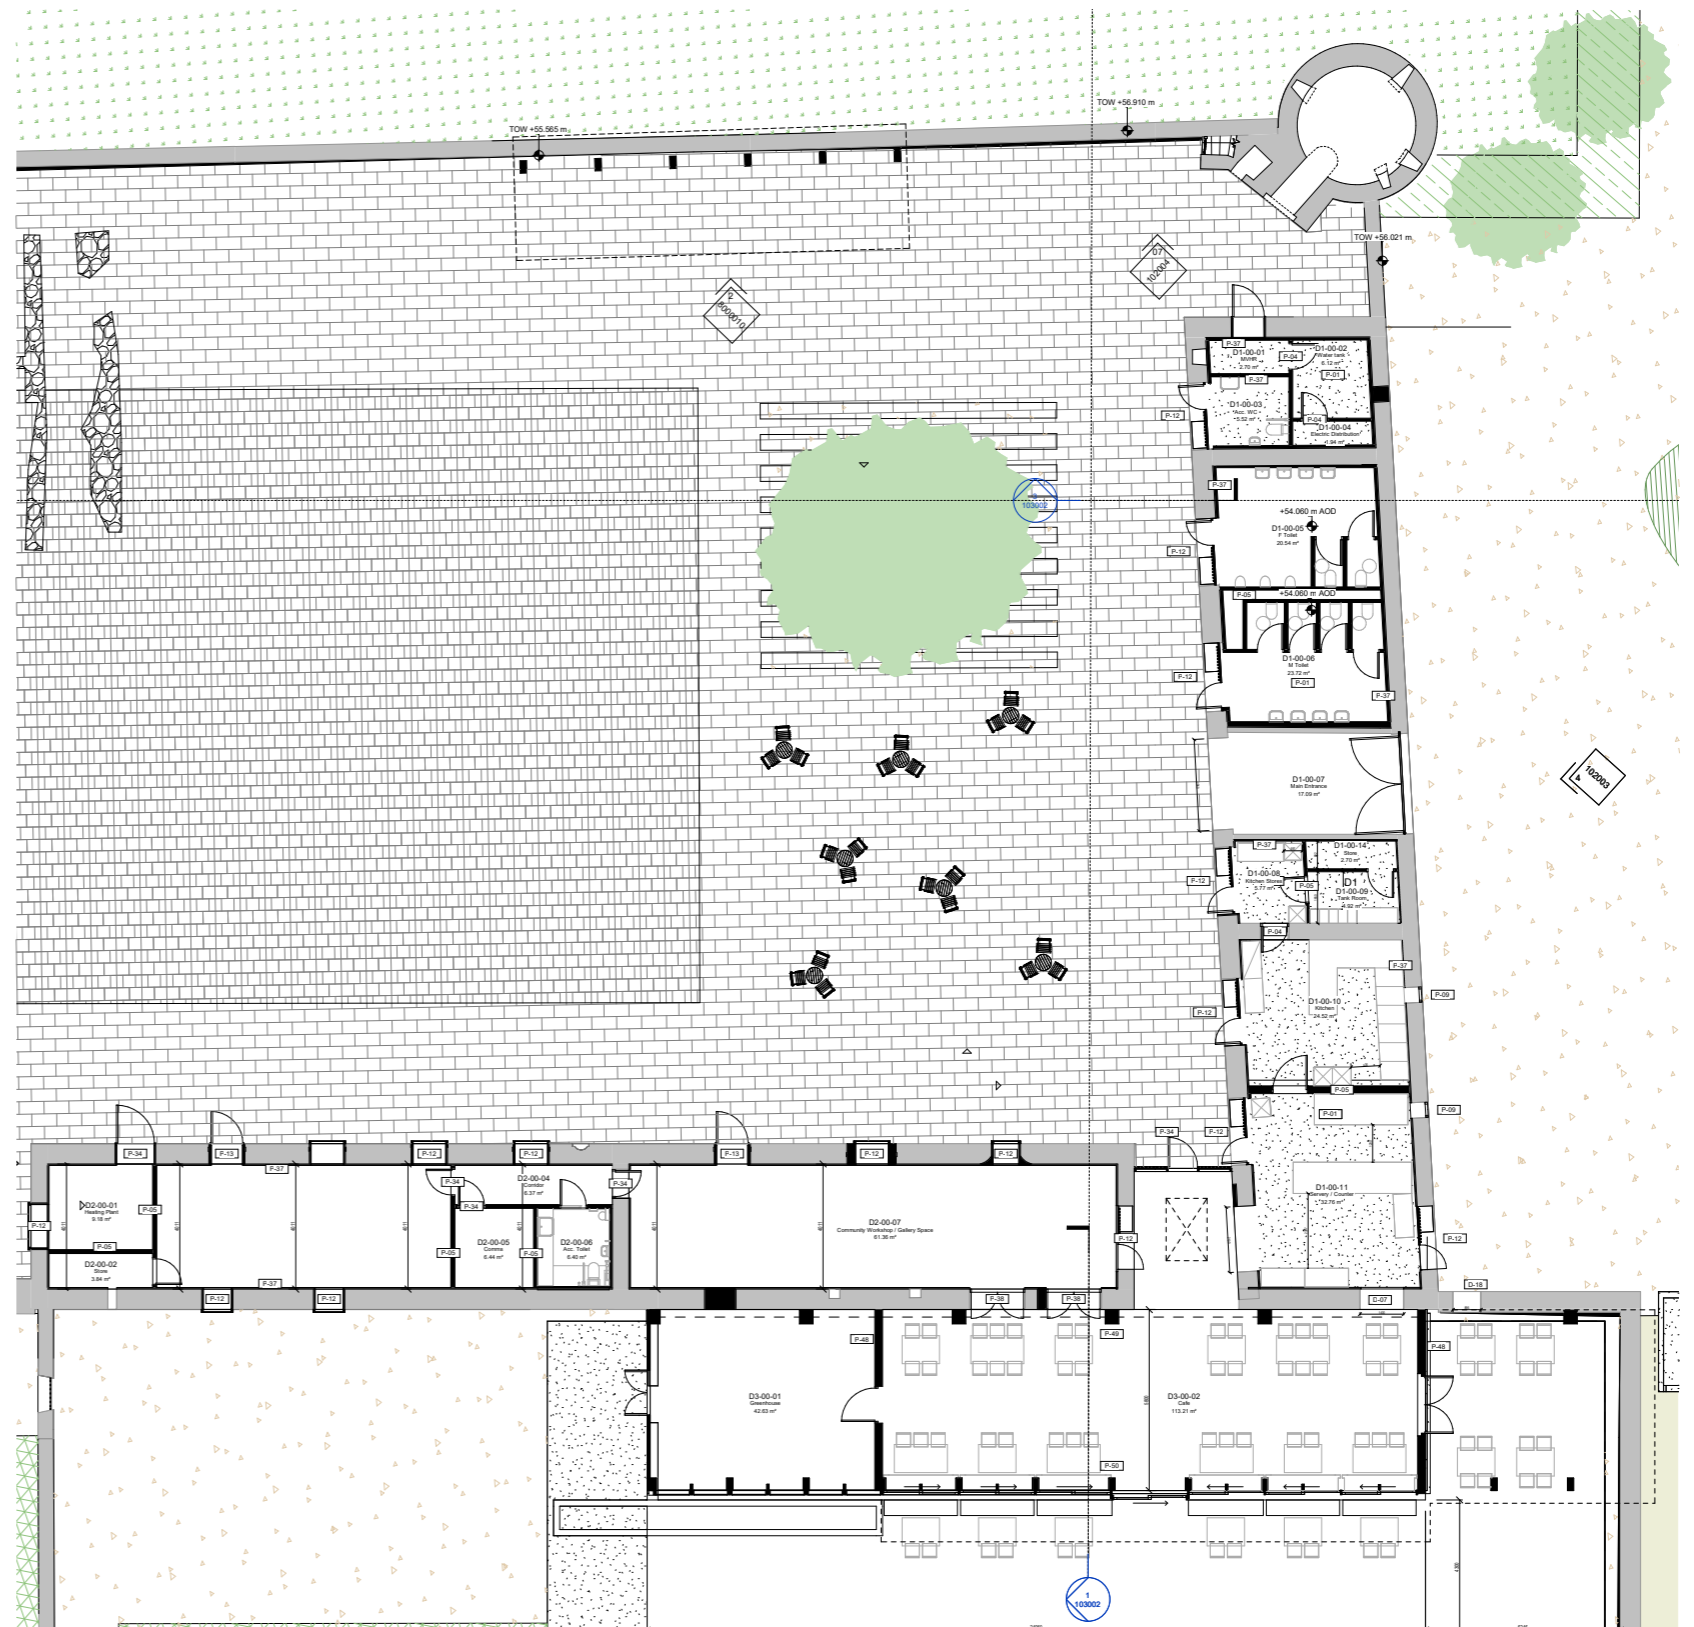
; Proposed Ground and First Floor Plan. Interventions in Black
